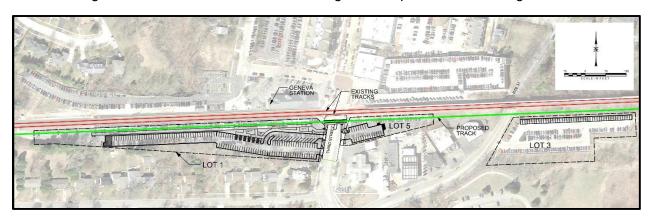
Geneva Metra Station Parking Lots Proposed for Reconfiguration
